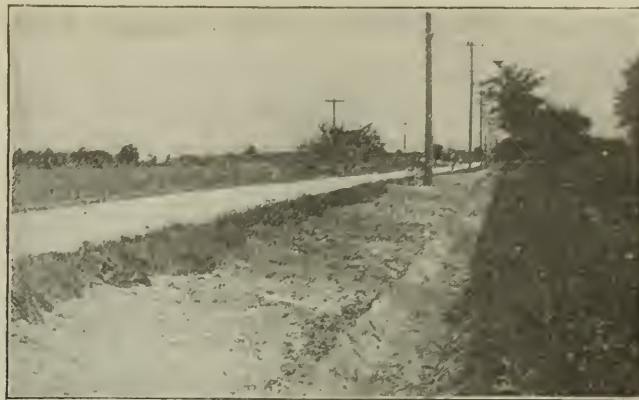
COMPLETED DITCH WITH EXCAVATED MATERIAL SPREAD ON SHOULDER
